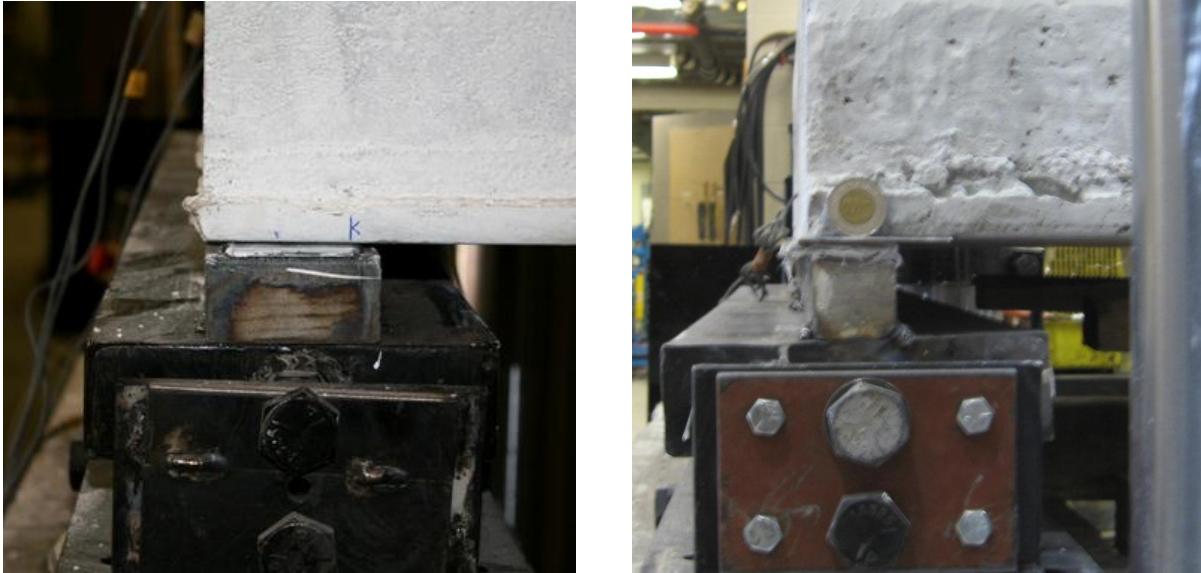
Views for loaded end supports (right, full bearing length “A” and left, reduced bearing length “B”)
